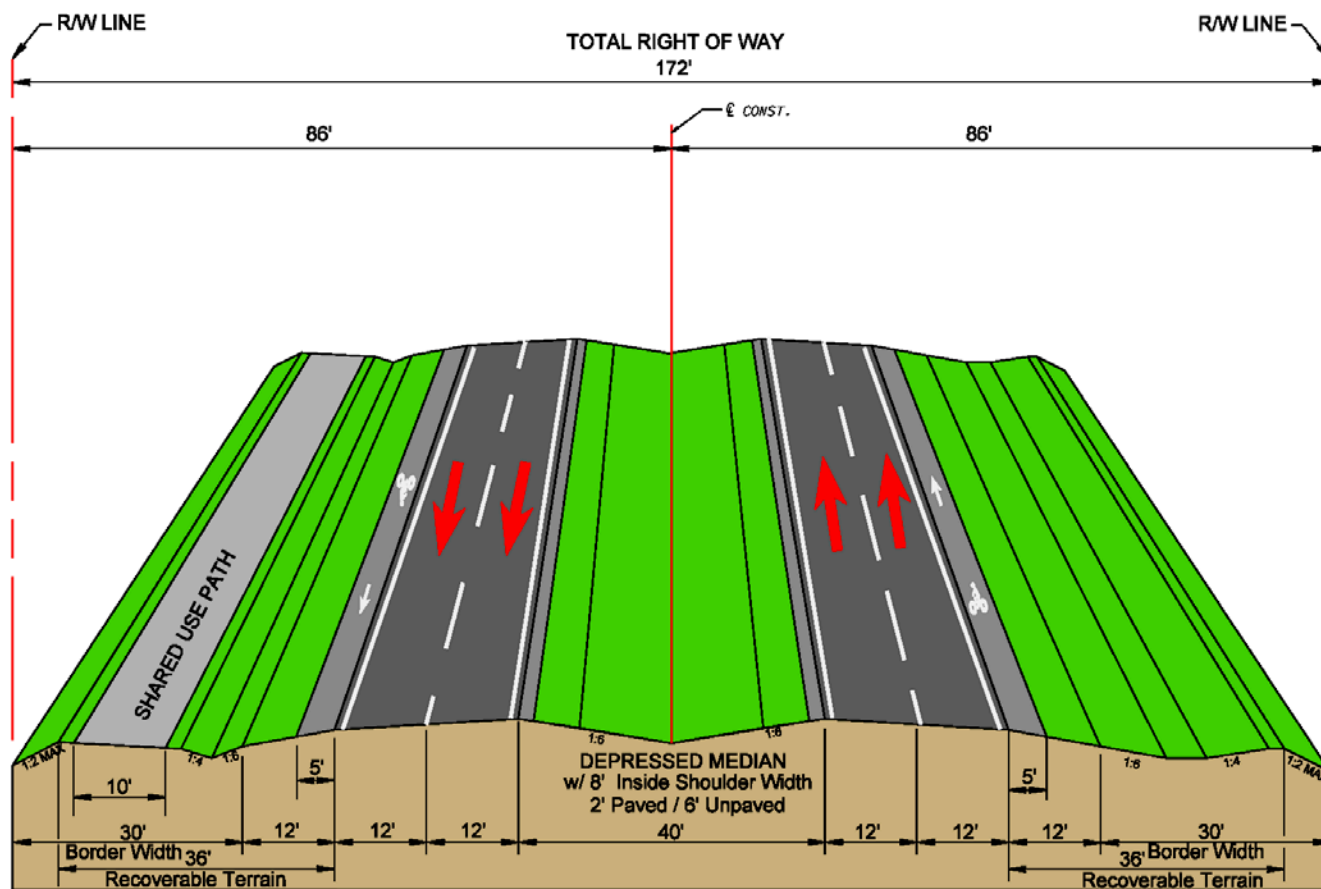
Alternative 3 Proposed Typical Roadway Section (Rural)
